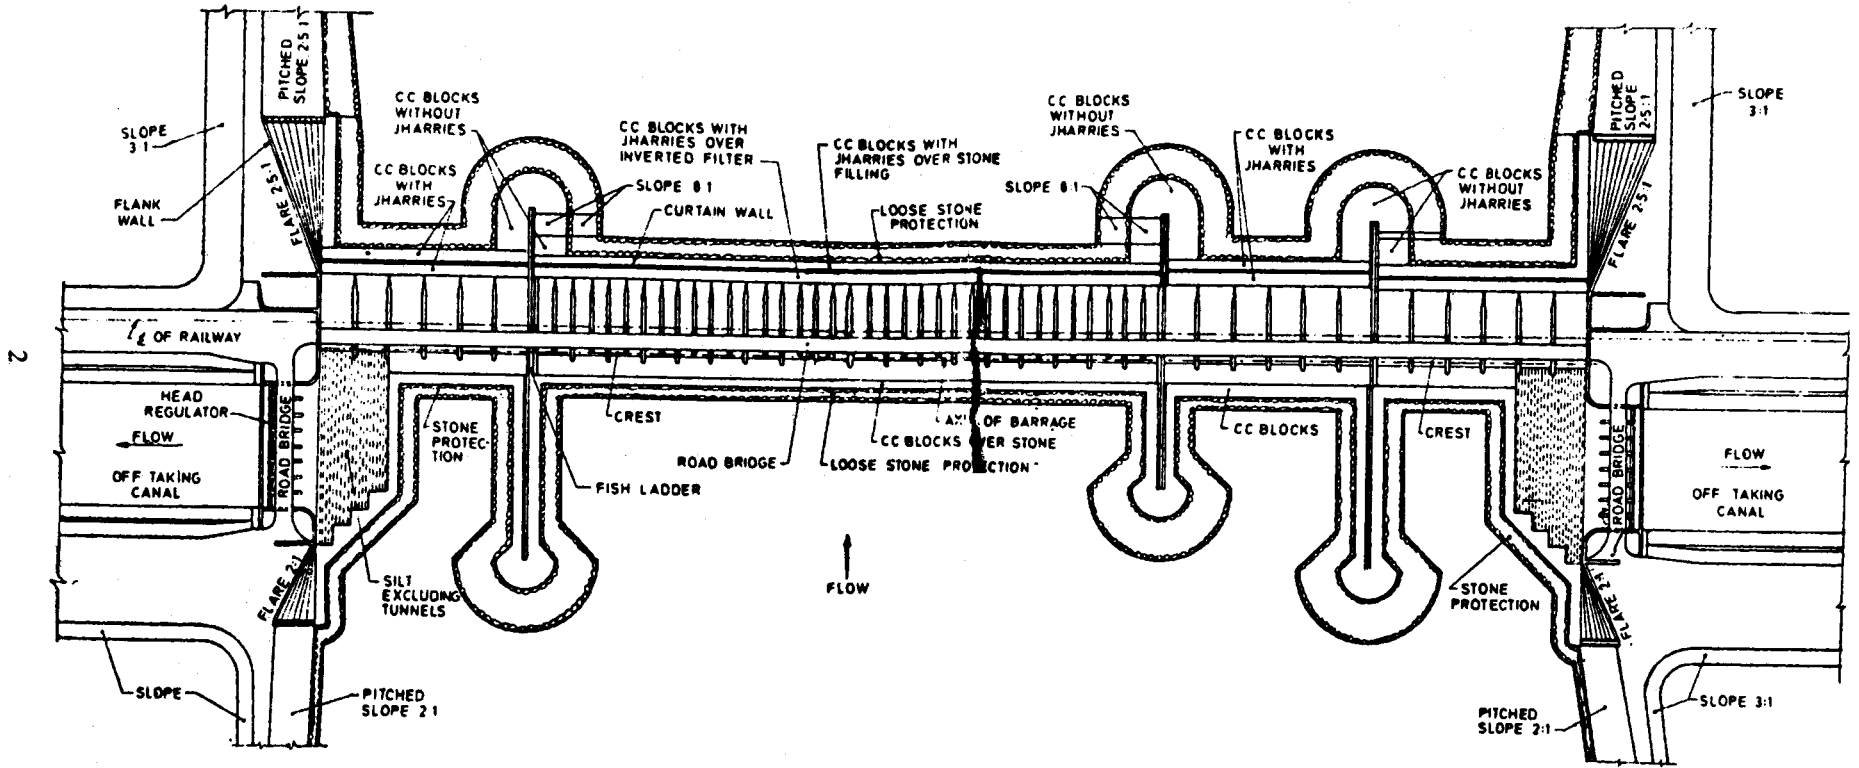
TYPICAL LAYOUT OF A BARRAGE
